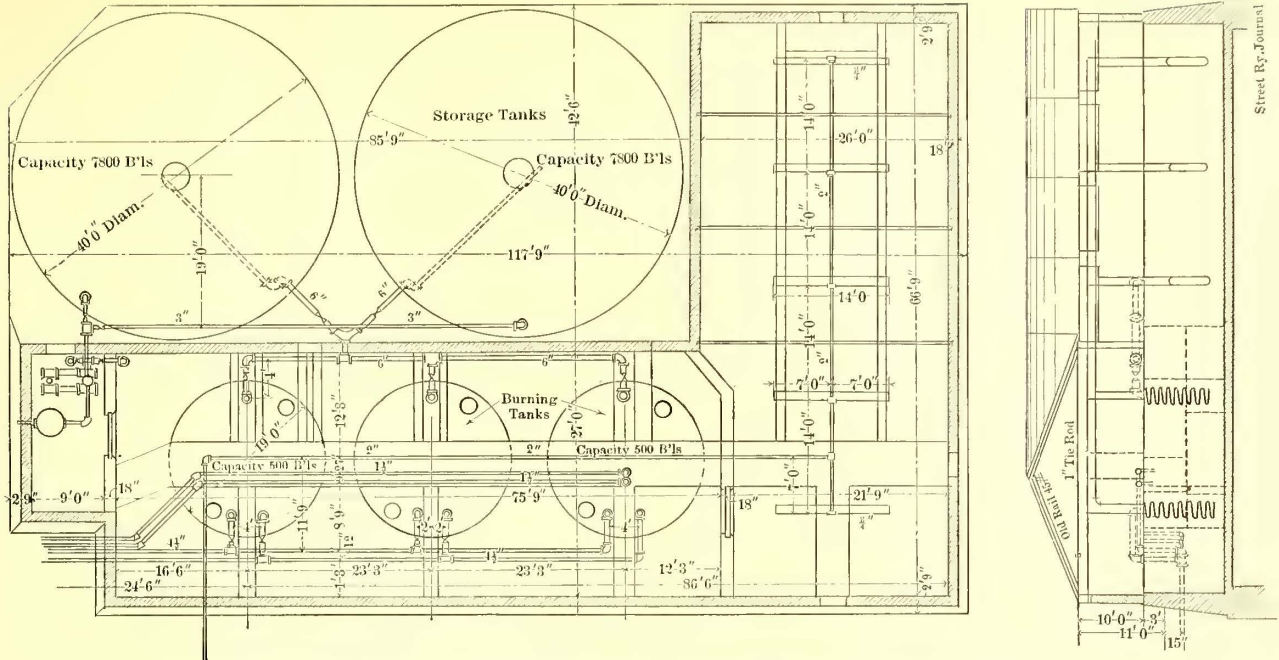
PLAN AND CROSS-SECTION OF OIL SYSTEM FOR OIL HOUSE
